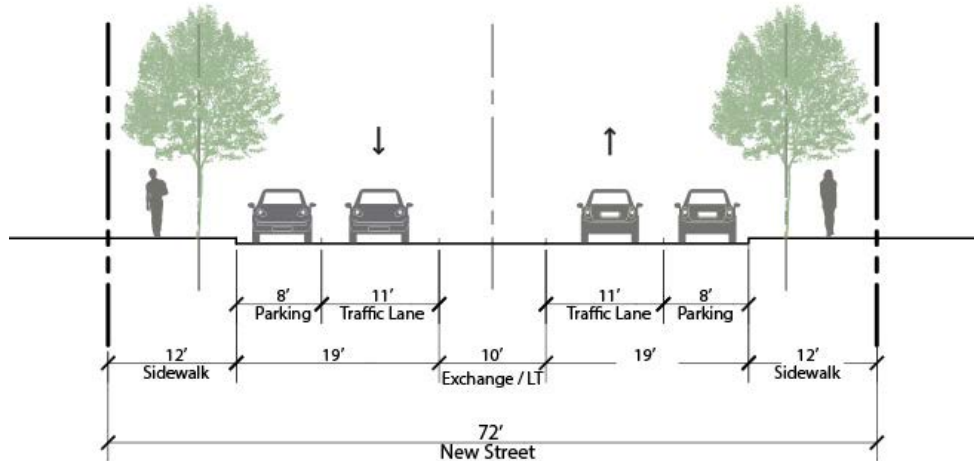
Commercial Core New Street with Center Turn Lane Typical Cross-Section.
